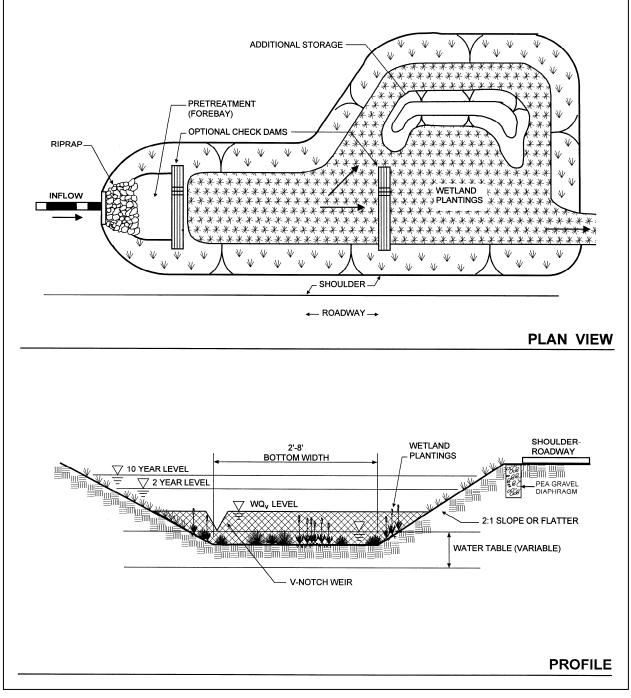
Schematic of a Typical Wet Swale (Source: Center for Watershed Protection)
